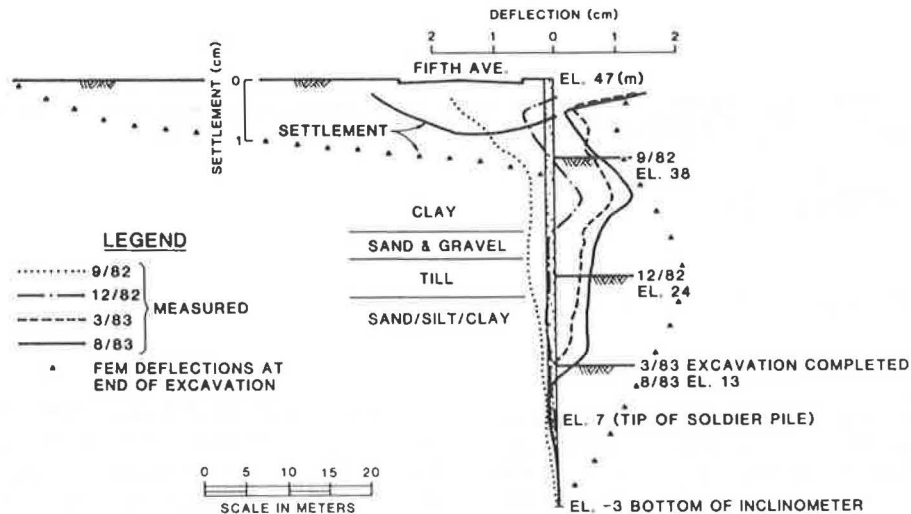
Shoring wall movements on the 34-m-deep Columbia Center excavation in Seattle, Washington (3).
